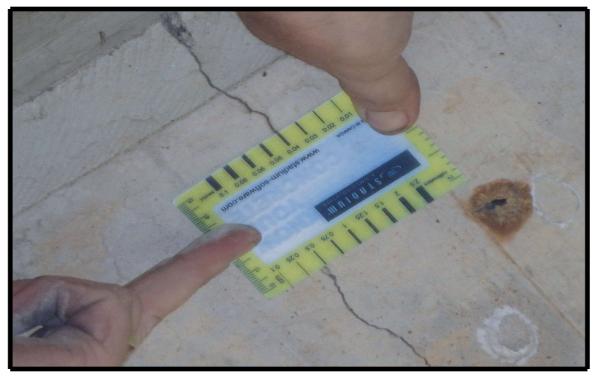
CRACK IN THE DOWSTREAM GIRDER
